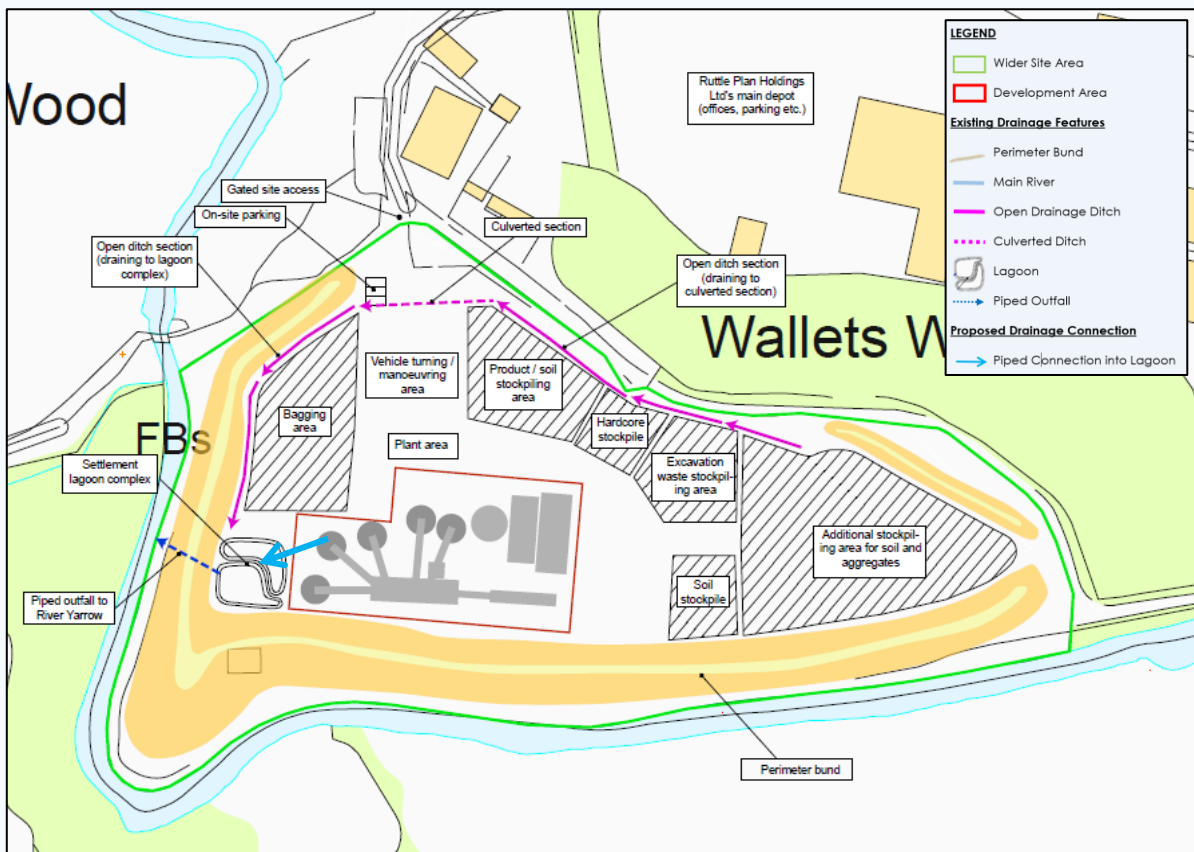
Preliminary Drainage Strategy Plan (The Mineral Planning Group Ltd., 2020)
